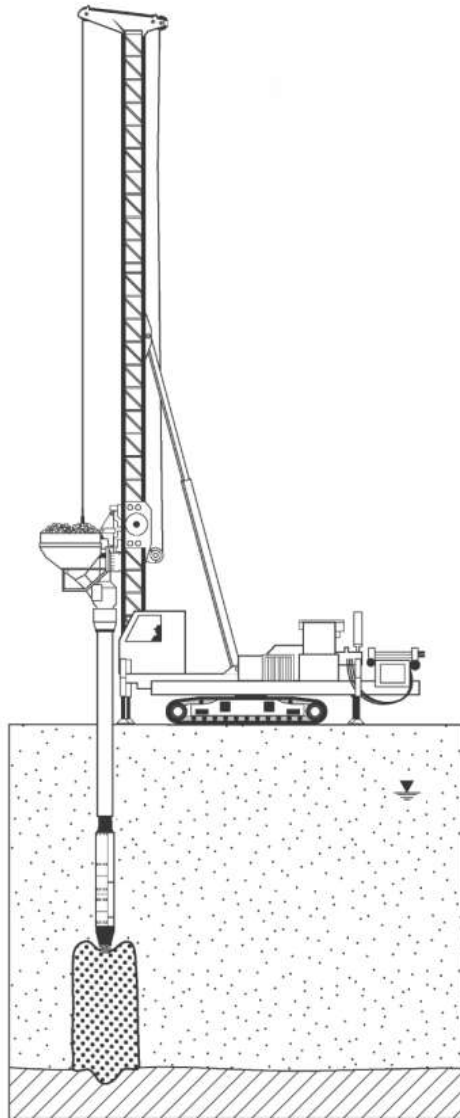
STONE COLUMN INSTALLATION USING DRY BOTTOM FEED METHOD
